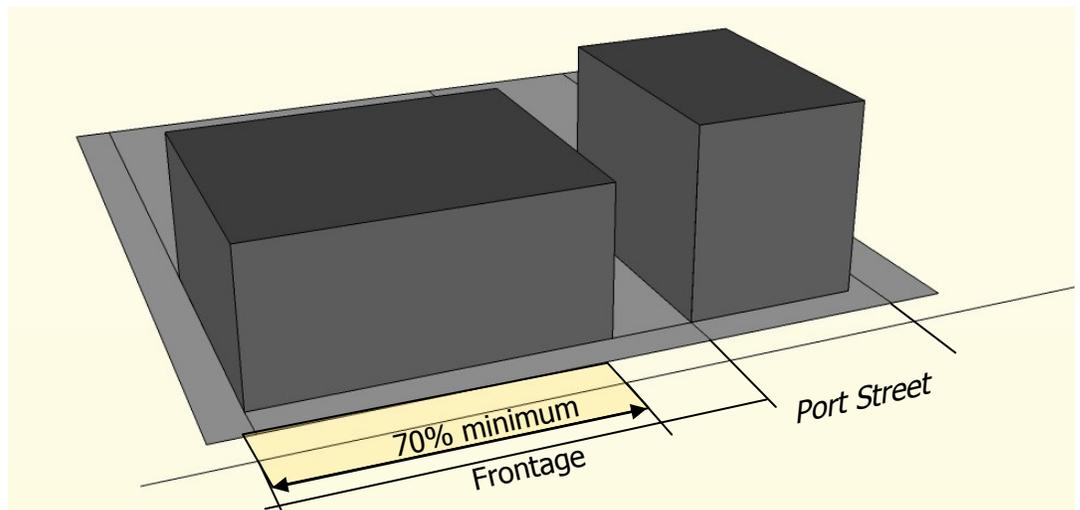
A minimum of 70% of the building shall front onto Port Street East and be within 0.6 m to 3.0 m
